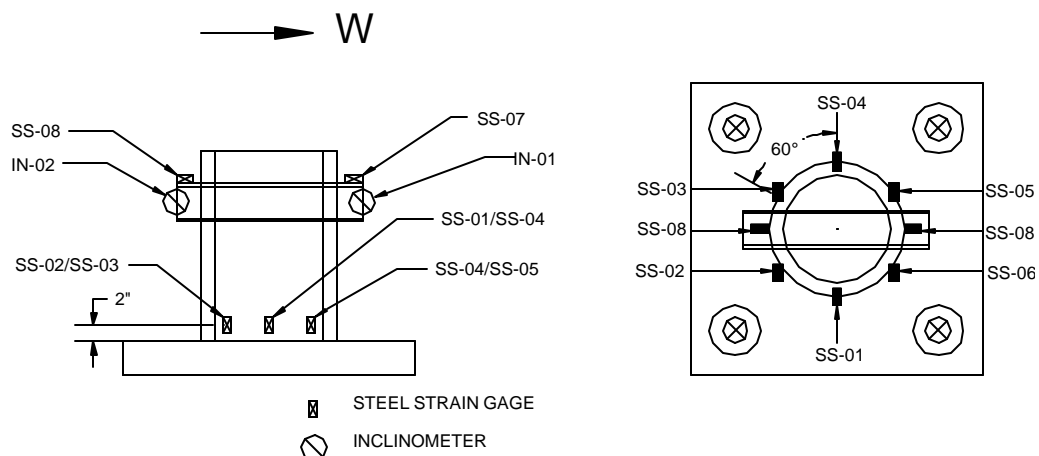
Bollard Instrumentation Plan - Bollard Elevation and Plan Views
